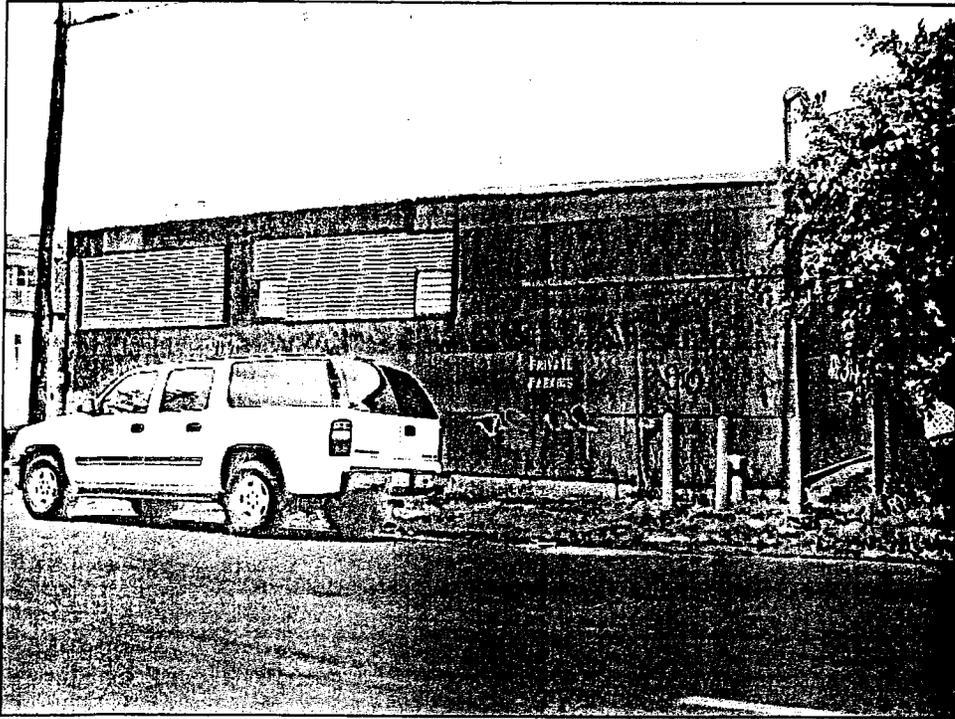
No sidewalks, curbs or gutters at 4123 Whiteside St.
